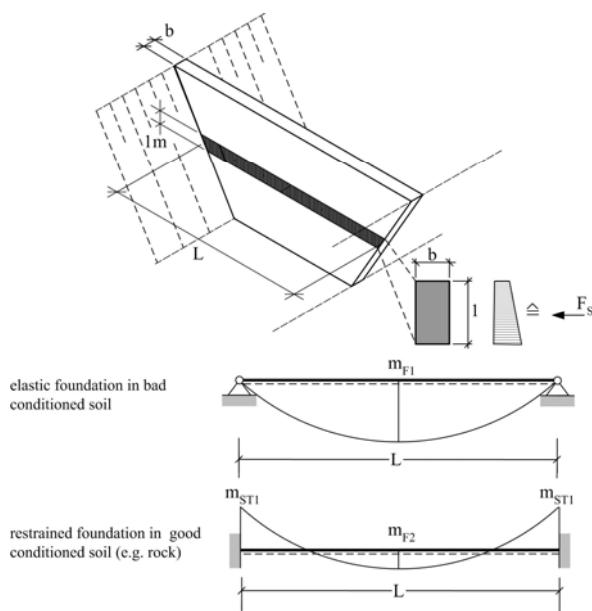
System 1: Slab barrier (single solid body barrier) – elastic foundation and restrained foundation
